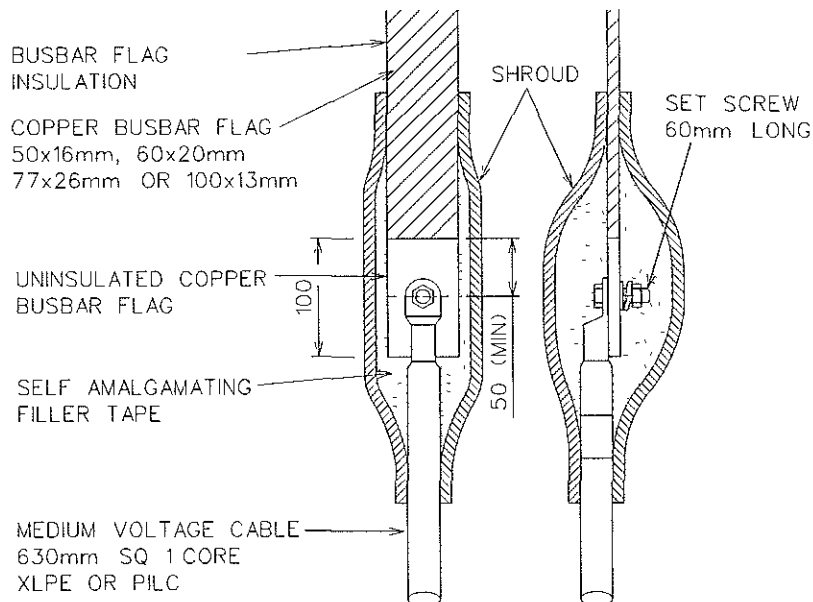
Terminal fixing point (busbar flag) and shrouded cable termination for 1-core cable
